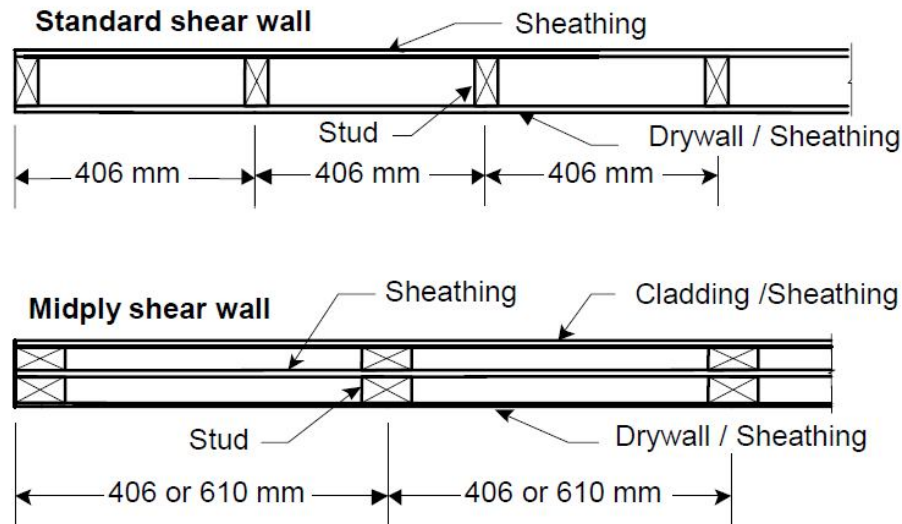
Cross section of a standard shear wall (top) and a MIDPLY wall (bottom) with two exterior panels [1.5].
